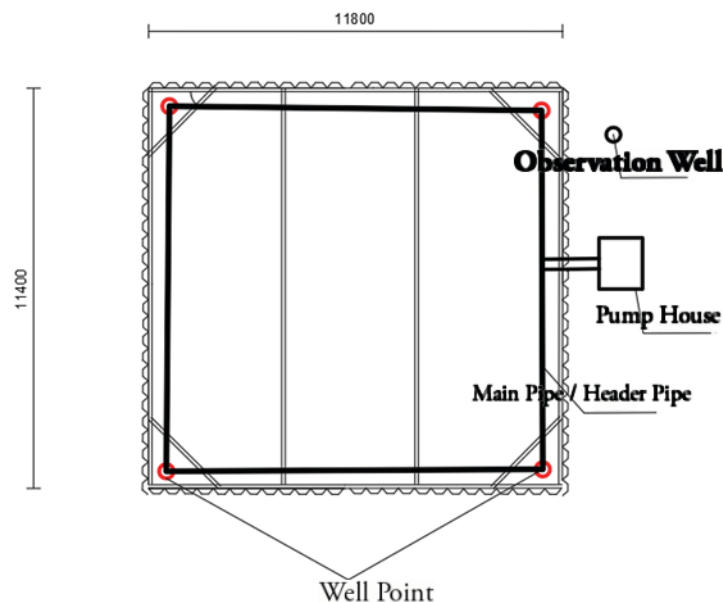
Layout plan of the dewatering system showing the well points arranged around the excavation perimeter, connected to the main/header pipe leading to the pump house, with an observation well provided for groundwater monitoring.
